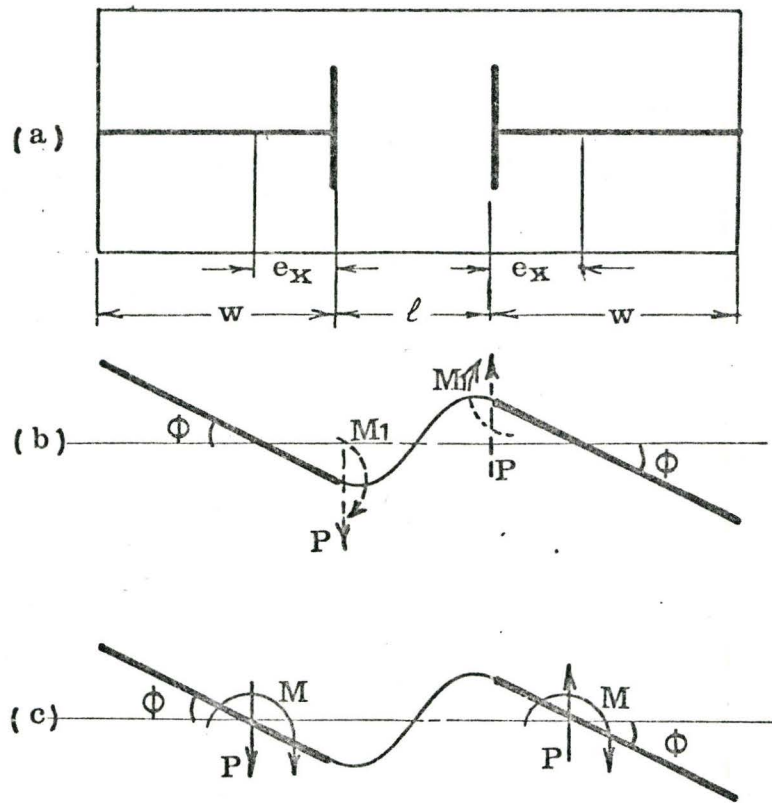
Typical Plan and the Rotation of T-Section Walls.
